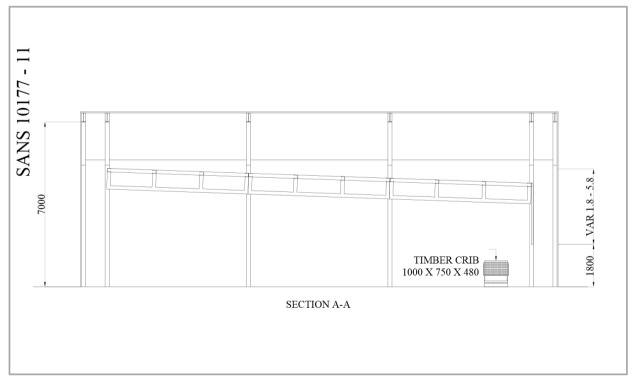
Typical roof test installation in the SANS 10177 - Part 11 facility
